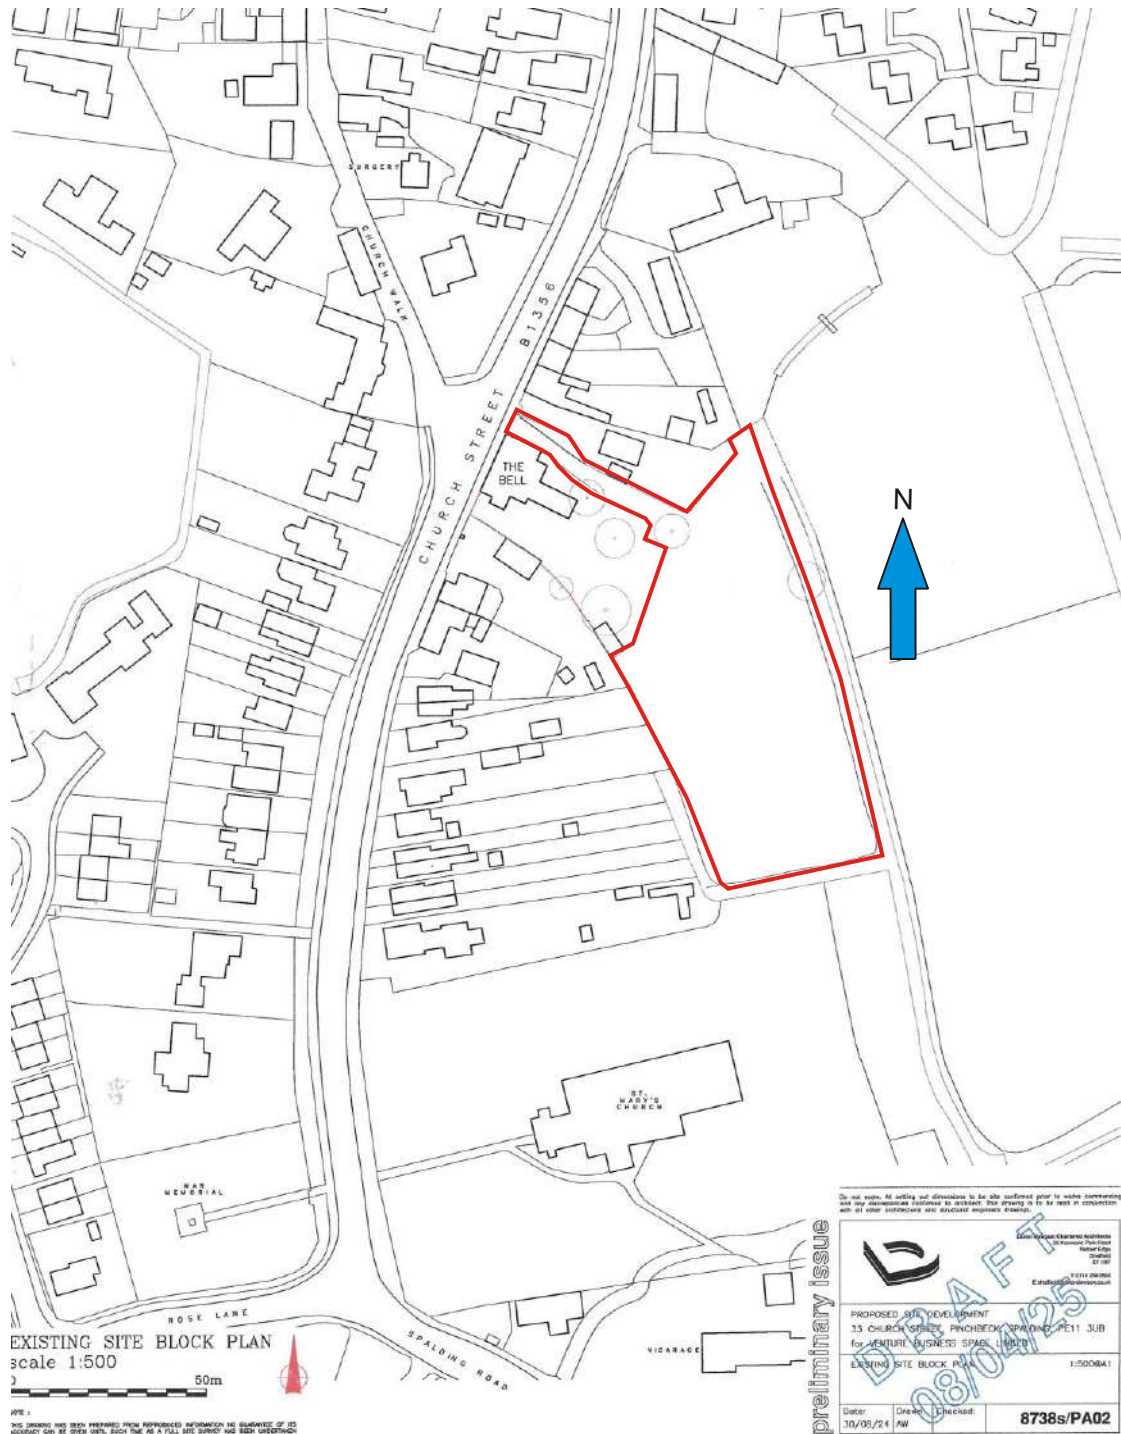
Site location at an original scale of 1:500 at A1, (extract from Architects plan). The assessment site is shown outlined in red.
